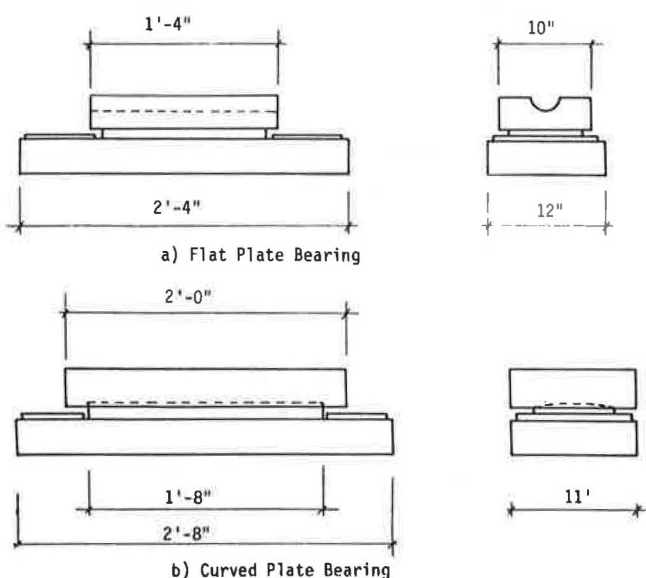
Self-lubricating bronze expansion bearings used in testing.
